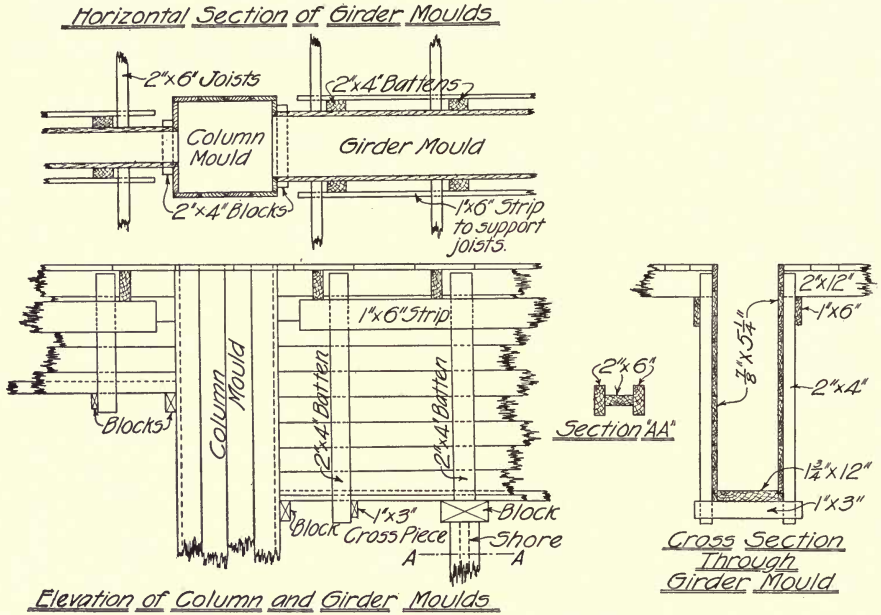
Sectional Plan and Elevation of Girder Molds. (See p. 100.)
